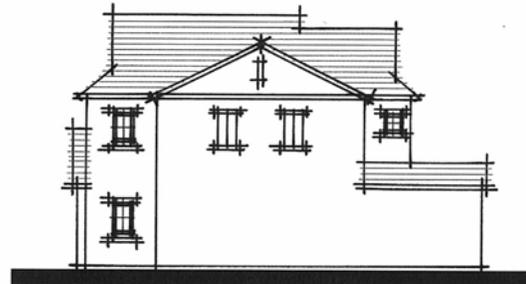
Plan 3 – Normandy Elevations
